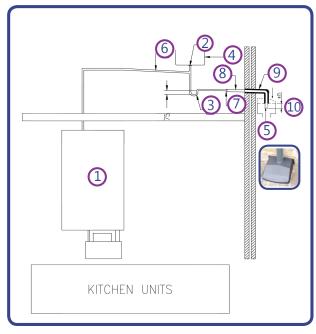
Connection of a condensate pump - typical method (NB manufacturer's detailed instructions should be followed).
